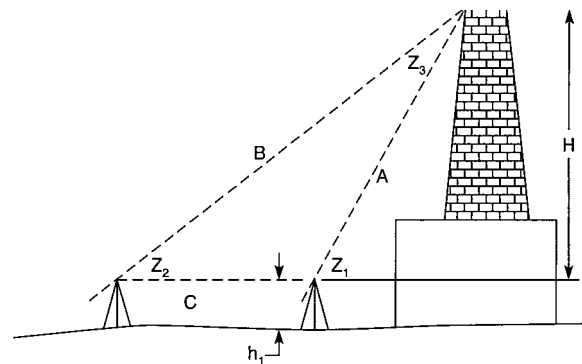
Determination of elevation of an inaccessible point.
